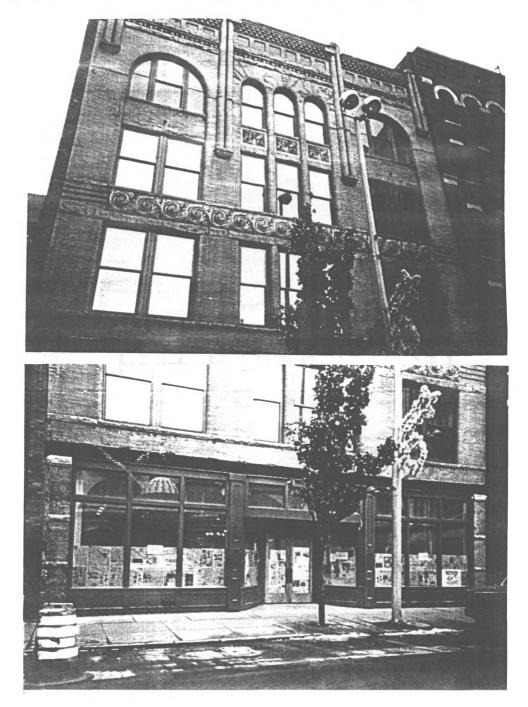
Photograph Number 5: Photograph Number 6: Southwest facade, 1997 photo South facade, street-level storefront detail
